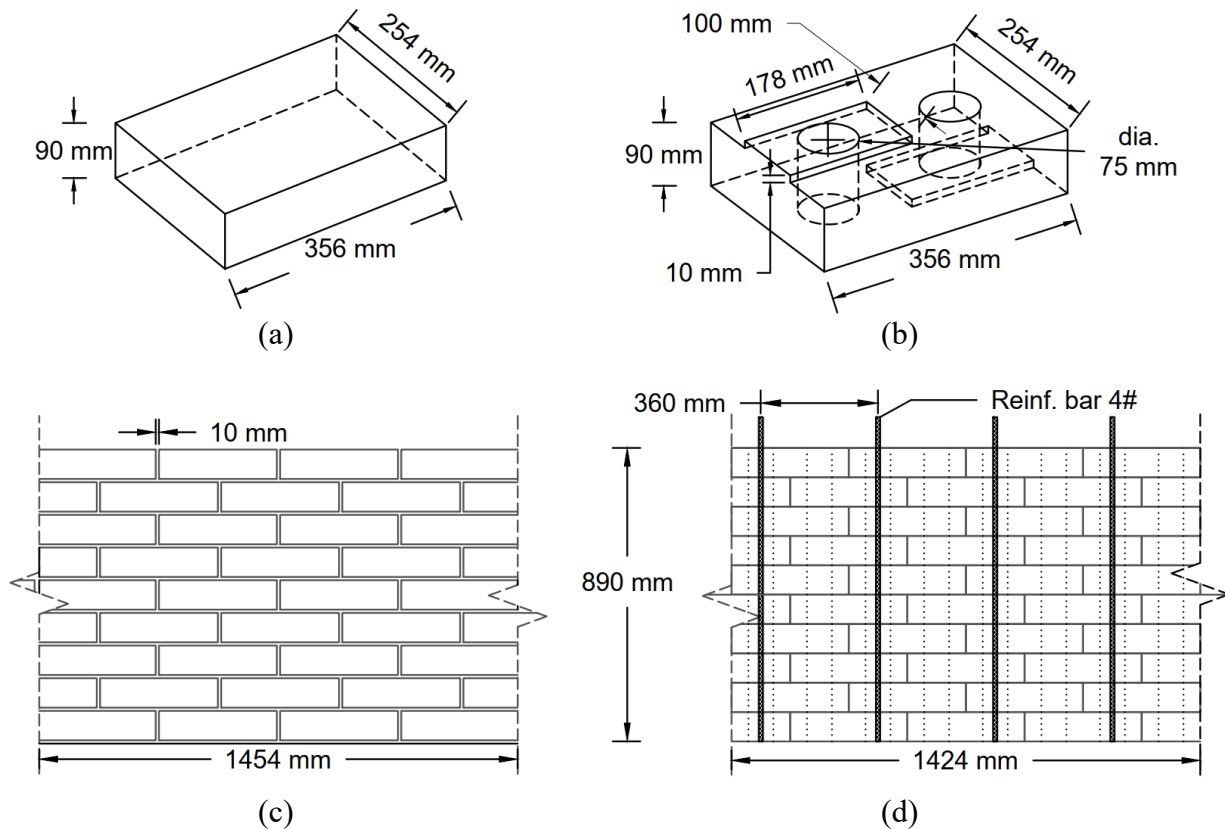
CSEB wall systems: (a) ordinary CSEB element, (b) ICSEB element, (c) mortared CSEB wall system, and (d) mortarless ICSEB wall system.
